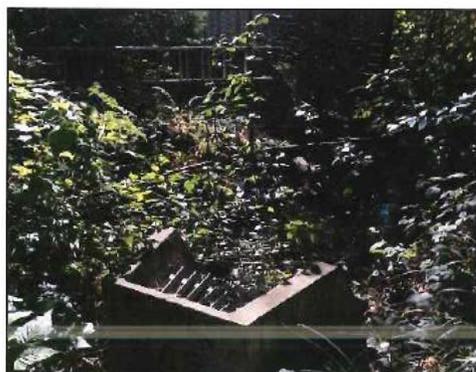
There is a drainage on the property to the north that drains into two storm inlets. One culvert is located beyond the ladder in the picture.
